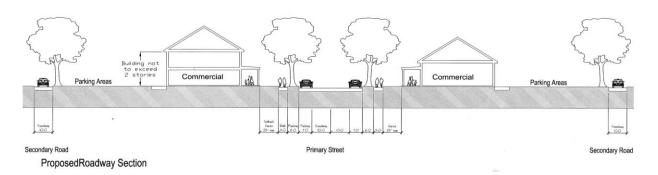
A.2. Illustrative Internal Road Cross Section
